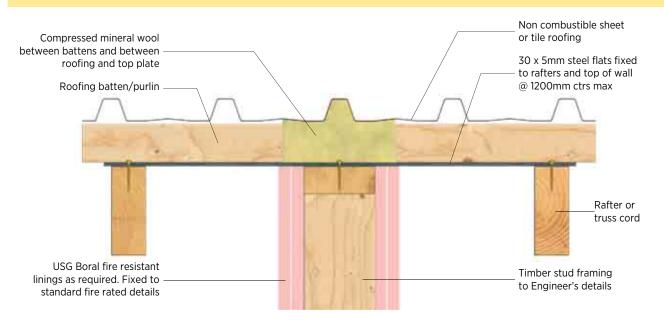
Standard Timber Stud Wall - Head to Roof Junction Detail
